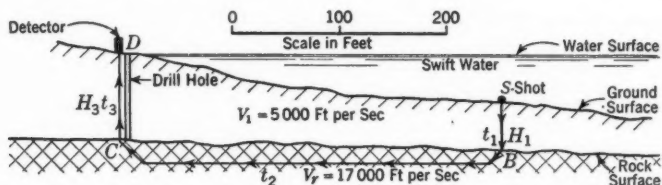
ARRANGEMENT OF APPARATUS FOR DETERMINING DEPTH OF OVERBURDEN IN SWIFT WATER
